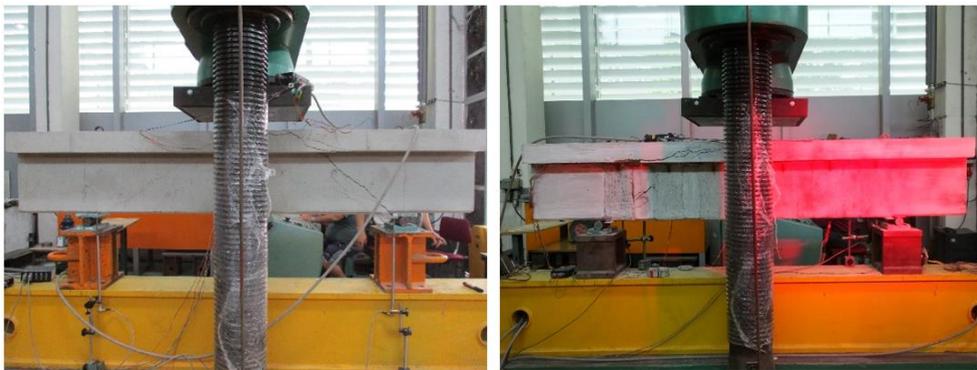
Beam failure a) reference beam, b) strengthened beam.
